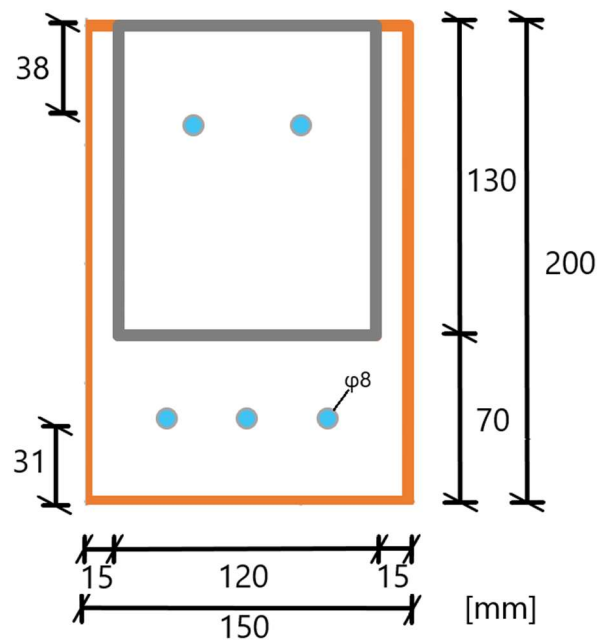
cross-section of reinforced hybrid concrete beam with a U-shaped SHCC mould
